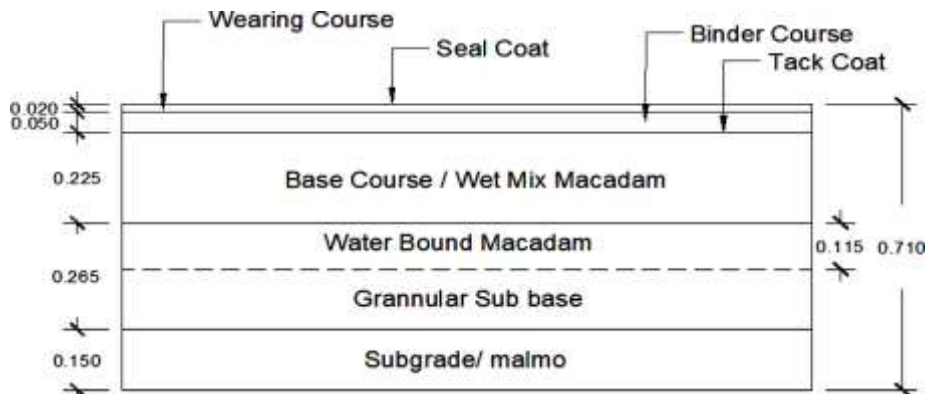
Pavement Layers for prepared sample (all dimension are in 'm')
